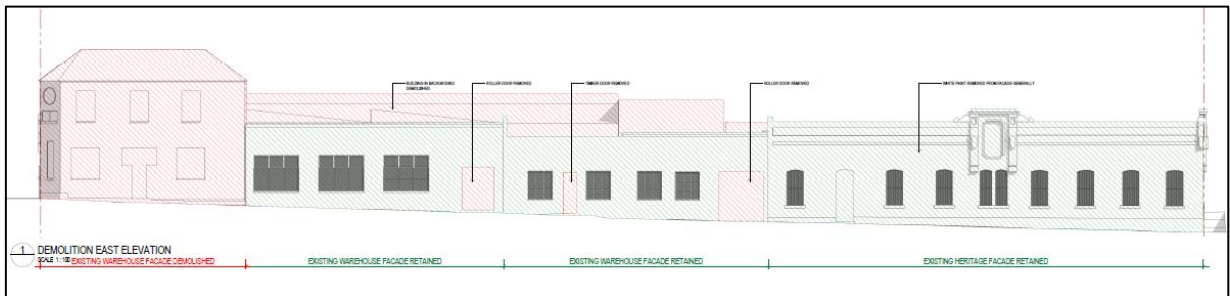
Extent of demolition along the Gore Street Façade (SJB Architects March 2020)
